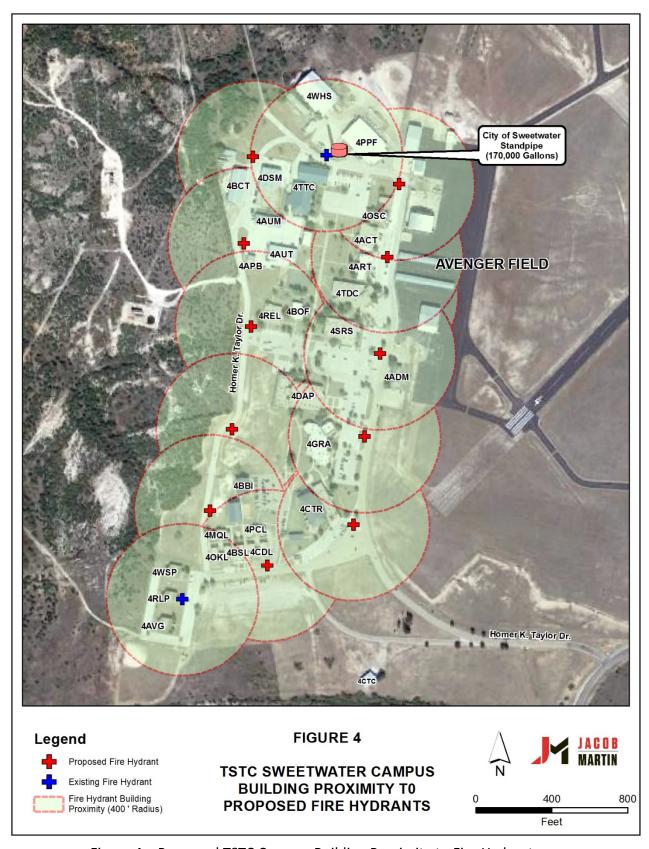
Proposed TSTC Campus Building Proximity to Fire Hydrants
